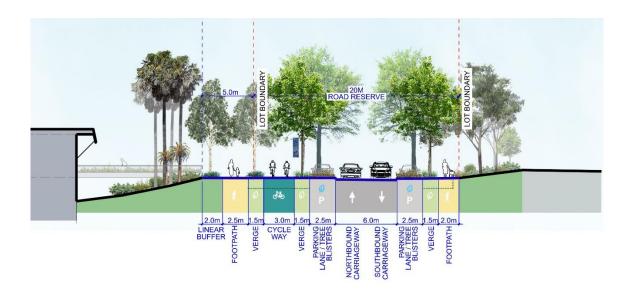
Proposed Secondary Green Boulevard (Lyonpark Road) Typical Cross-Section
